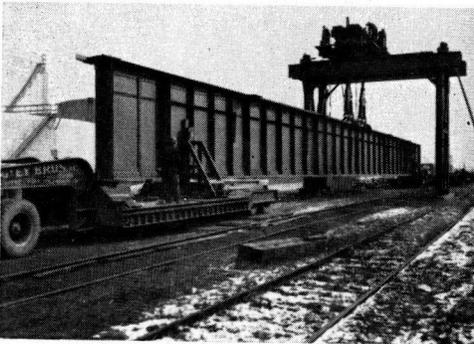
Approach girders for New Jersey Turnpike Bridge over Newark Bay.
